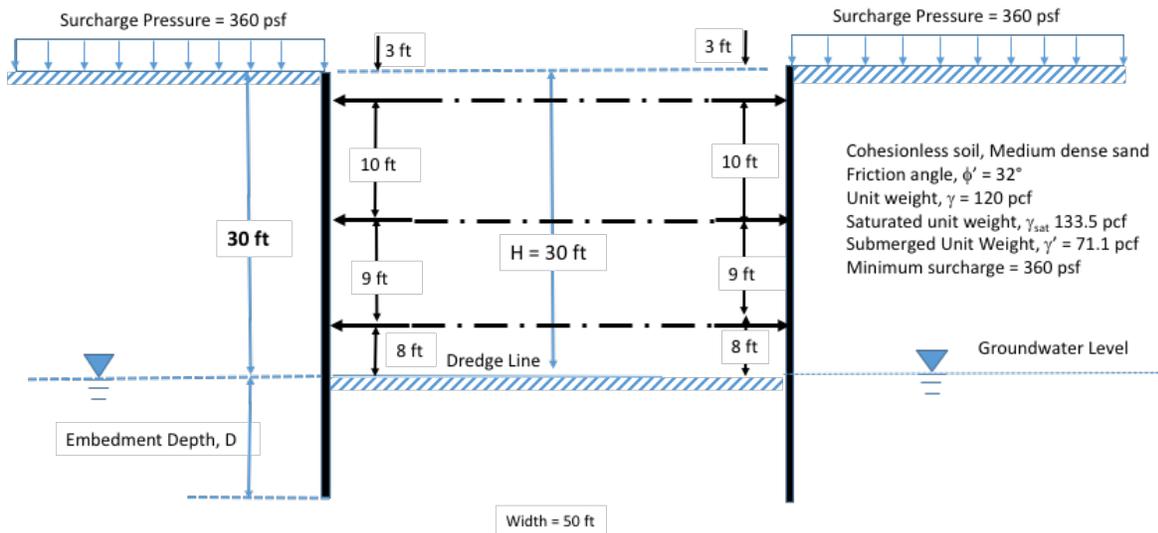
Case 7 Braced wall design parameters in cohesionless soil.
